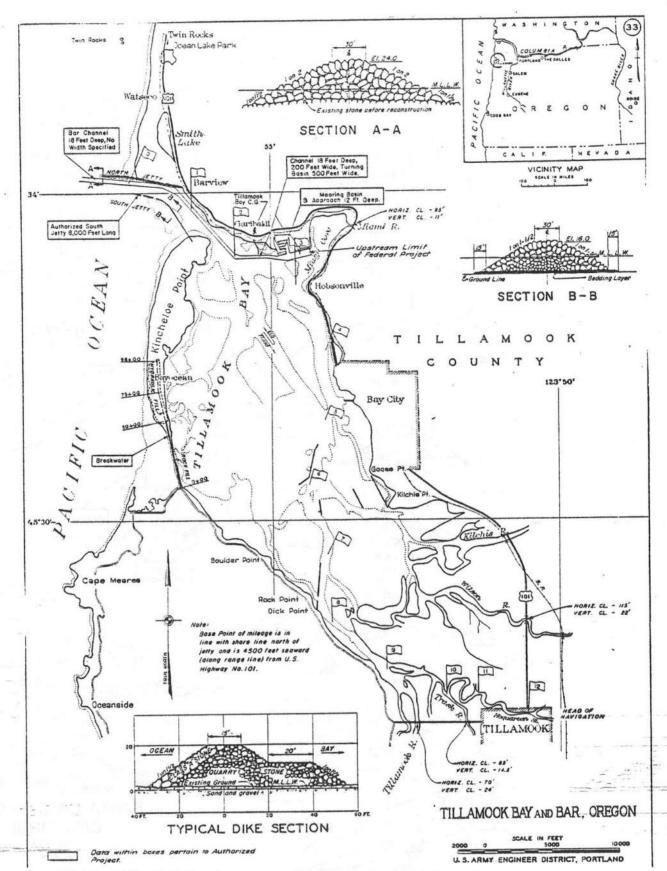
Breakwater at Tillamook Bay and Bar, Oregon
